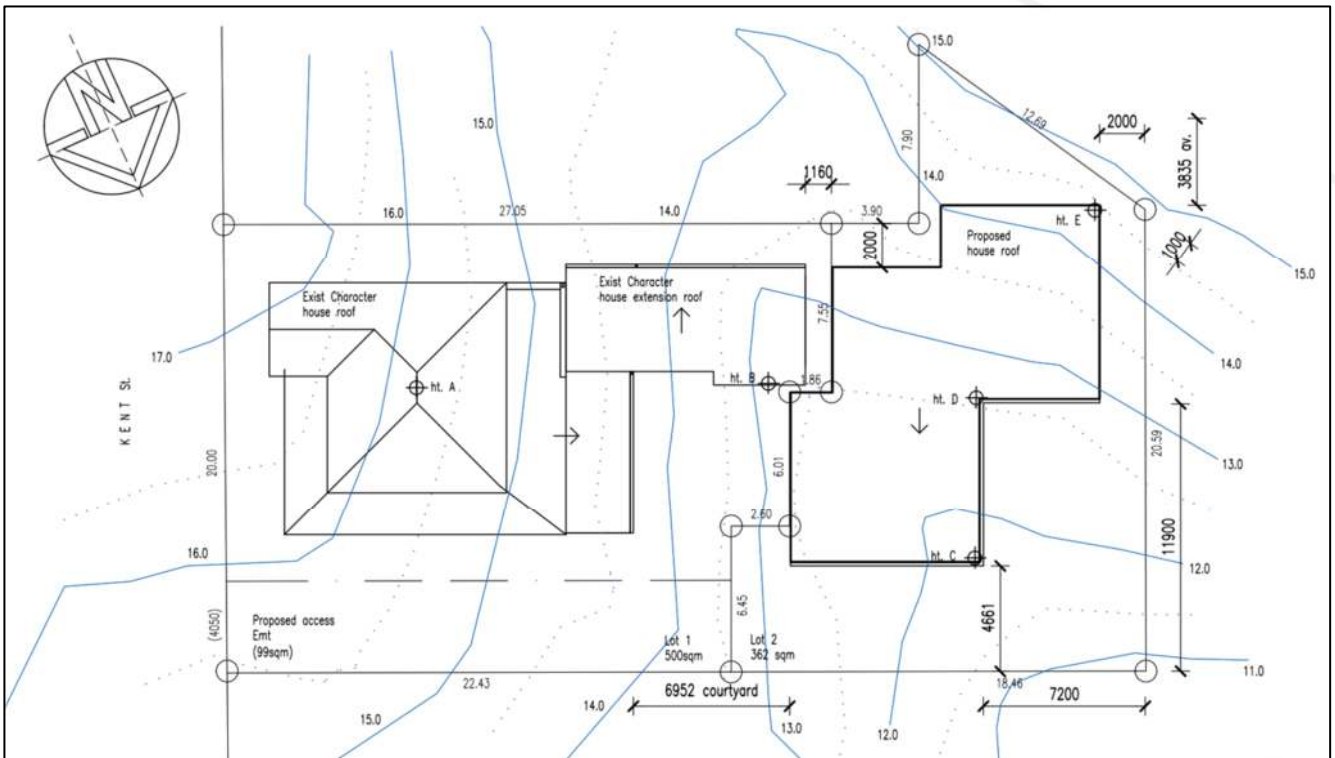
Proposal Plan (Source: Price Musgrave Architecture)
